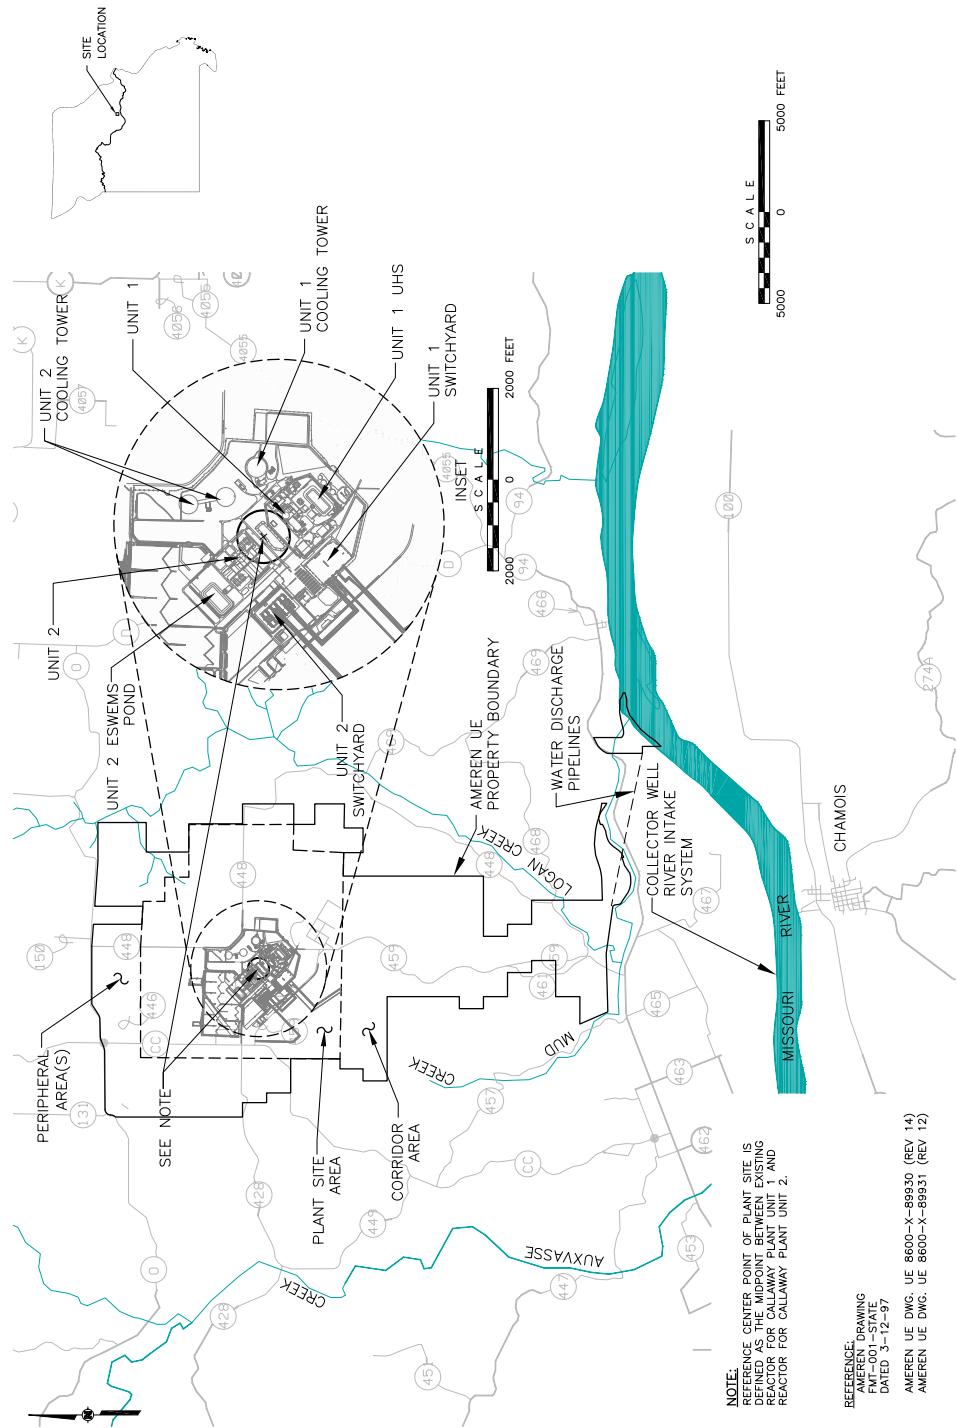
Callaway Plant Site and Proposed New Plant Layout
